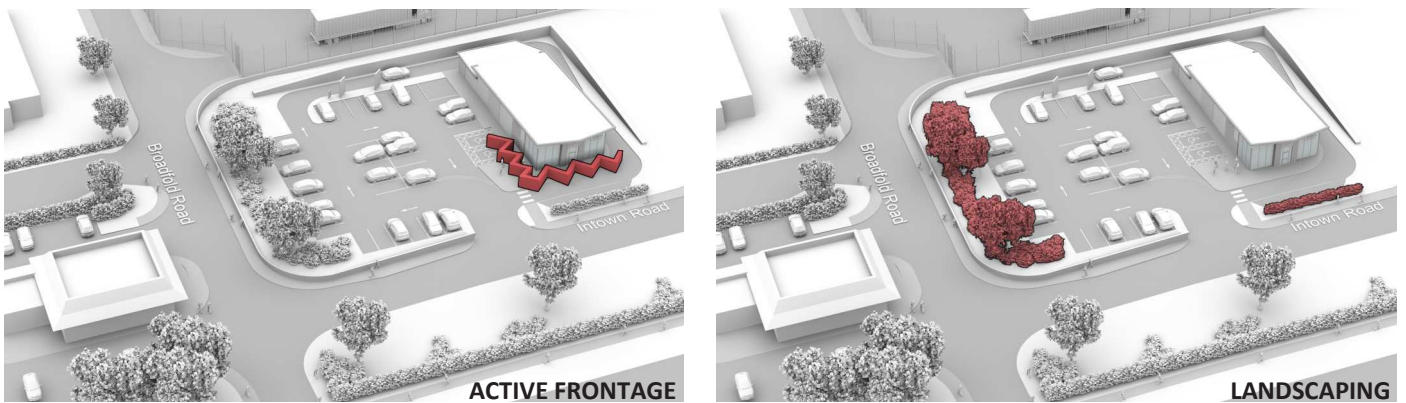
The location and orientation of the proposed building has been determined by the visibility of the site, and the desire to provide an 'active frontage' to Broadfold Road, Intown Road and the A90 beyond. The building will contain a seated restaurant, and as such will provide an opportunity for glazing to be incorporated within the elevations. The glazing will therefore be formed on the eastern/southern elevations providing visual interest and activity to the building's most prominent corner. The site currently benefits from mature landscaping along the edge of the A90, softening the views into the site while providing a better view out of the proposed restaurant. There is also existing landscaping along the southern boundary of the application site, which will be retained/strengthened, while the eastern boundary will receive low level planting.
